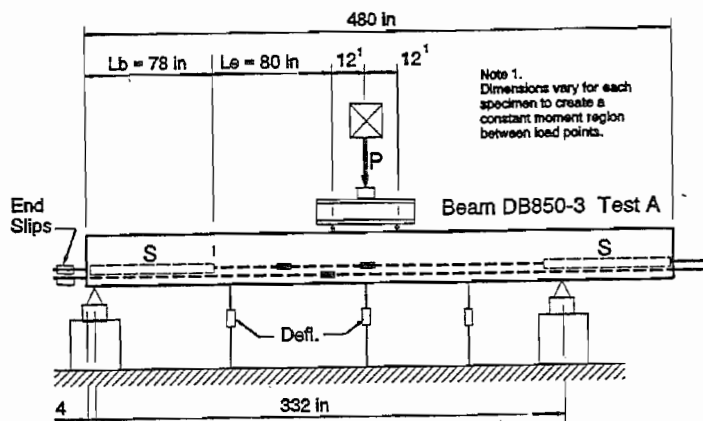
Typical Test Setup for Beams With Debonded Strands
